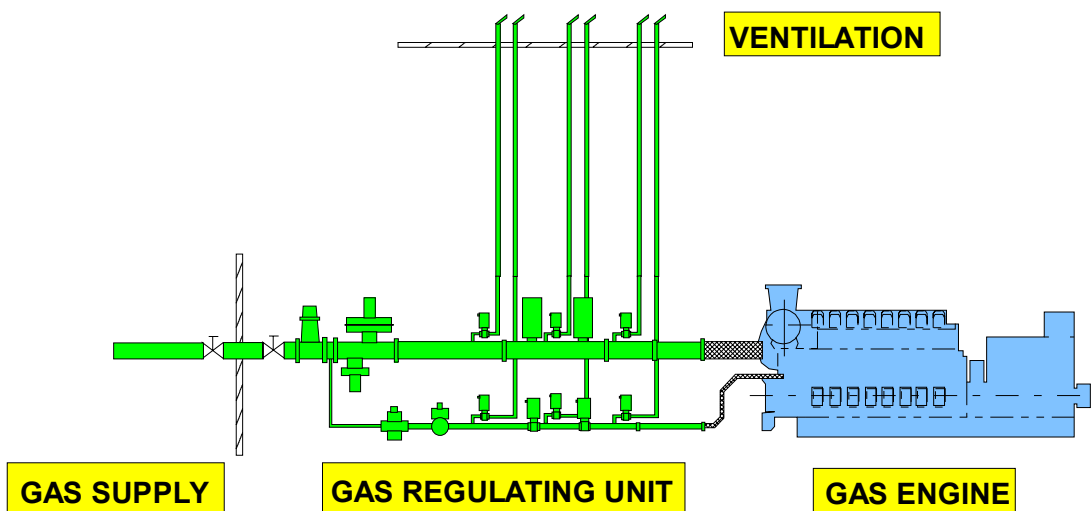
Gas fuel system illustrating main shut off valve, gas regulating unit and gas engine.
